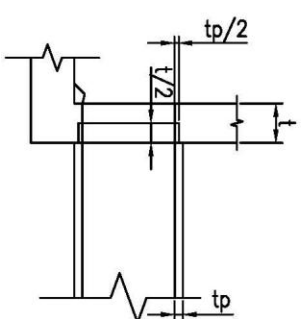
DETAIL OF MANHOLE COVER & ADJUSTABLE RING
